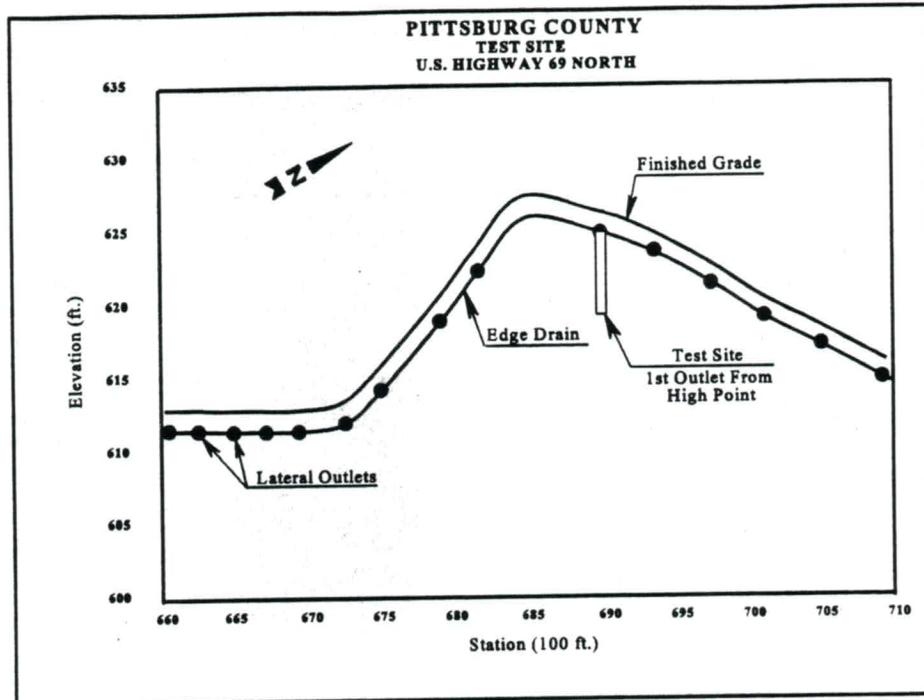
Longitudinal slope of the roadway at the Pittsburg county site
